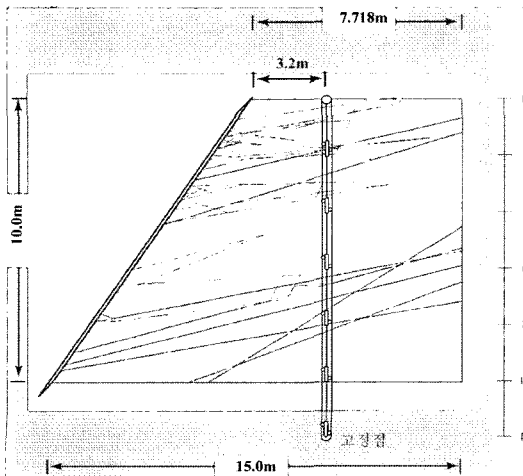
Sliding joints and blocks on the cross section containing clinometer
